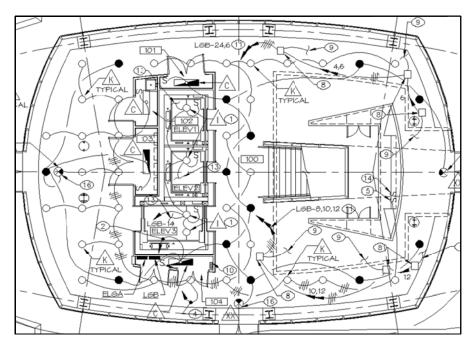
Lobby/ Main Stair | First Floor | Lighting Plan
